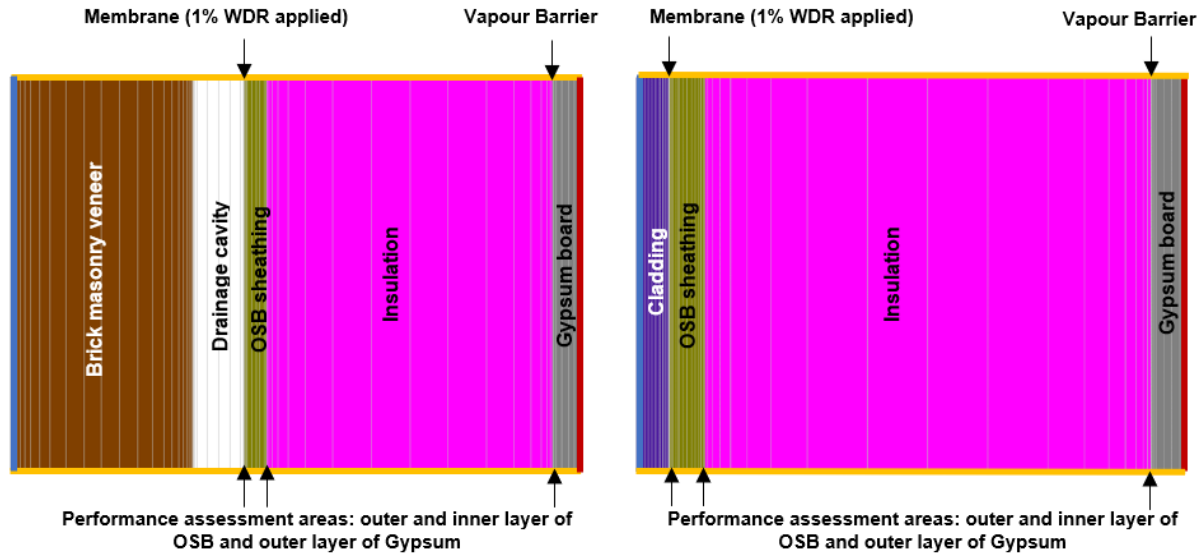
Geometry and meshing of a portion of the vertical section of a) brick veneer wall and b) stucco, vinyl and fibreboard claddings.
